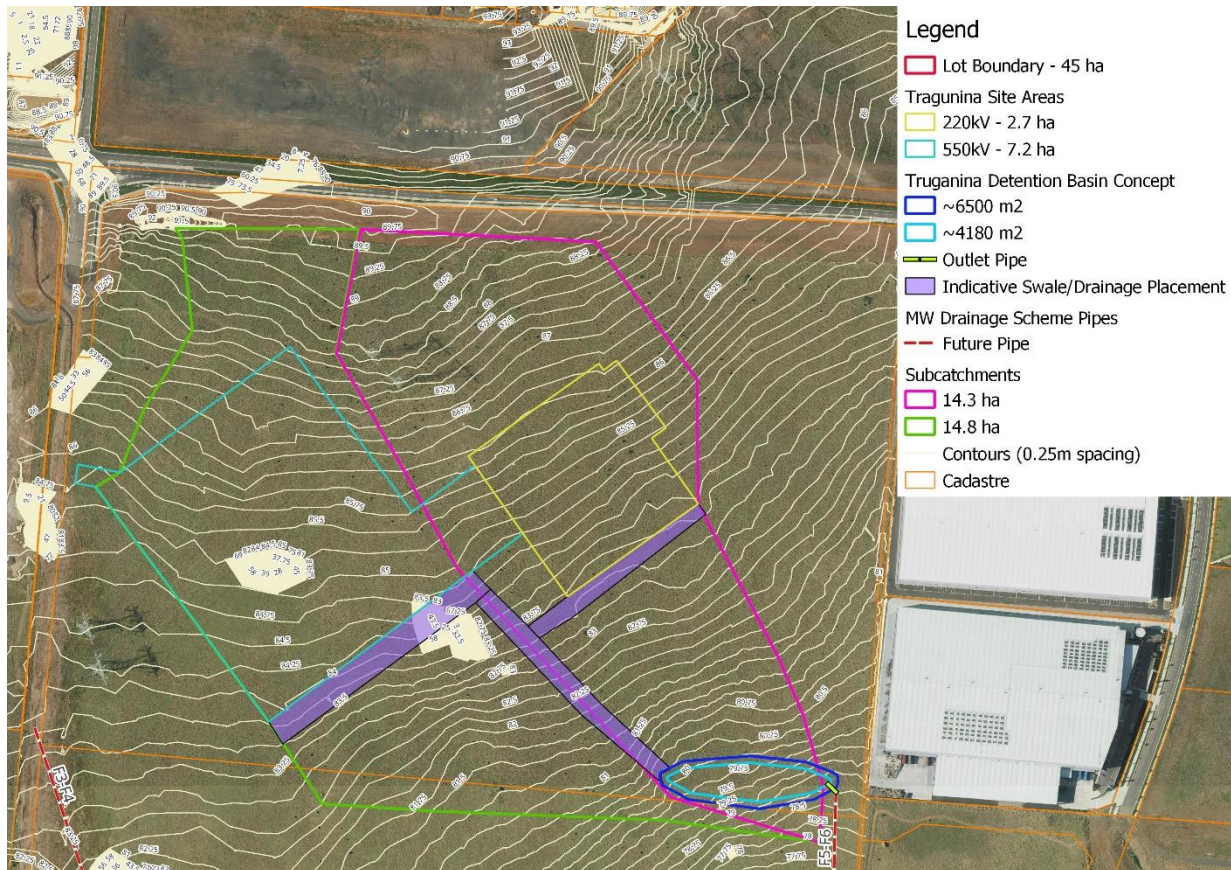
Indicative (Zoomed in) Layout of Site with Temporary Retarding Basin and Swale/Drainage
